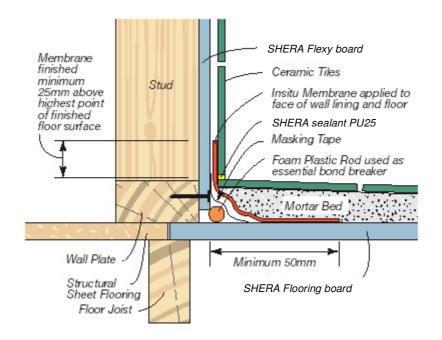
Perimeter flashing. Insitu membrane in general wet area
